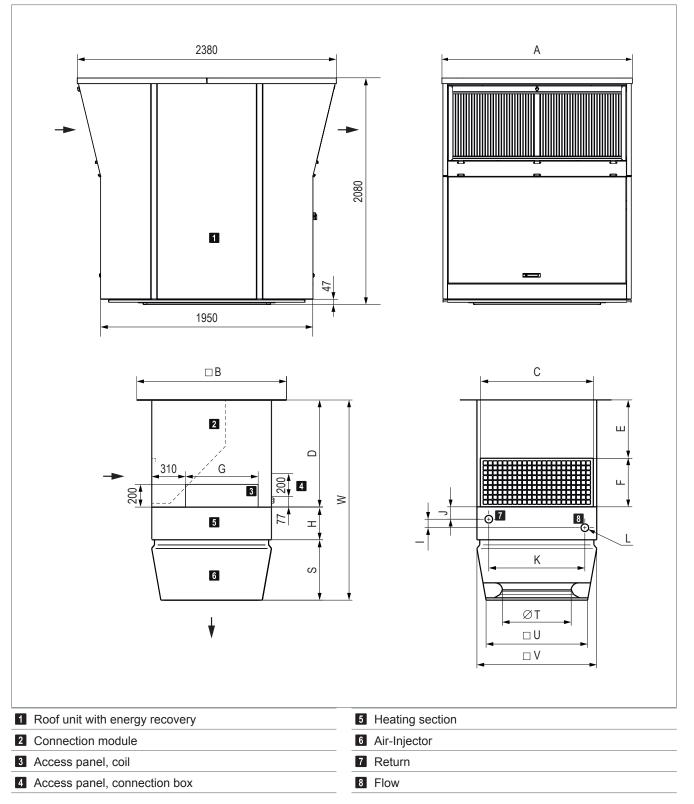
Dimensional drawing for RoofVent® RH (dimensions in mm)
